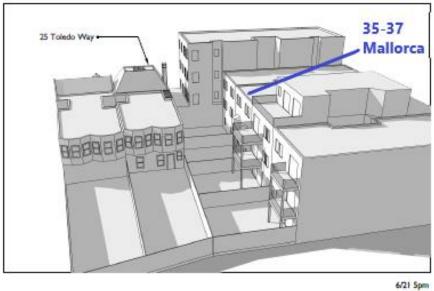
View of our rear yard and the existing building with the approximate height of the two-story addition
